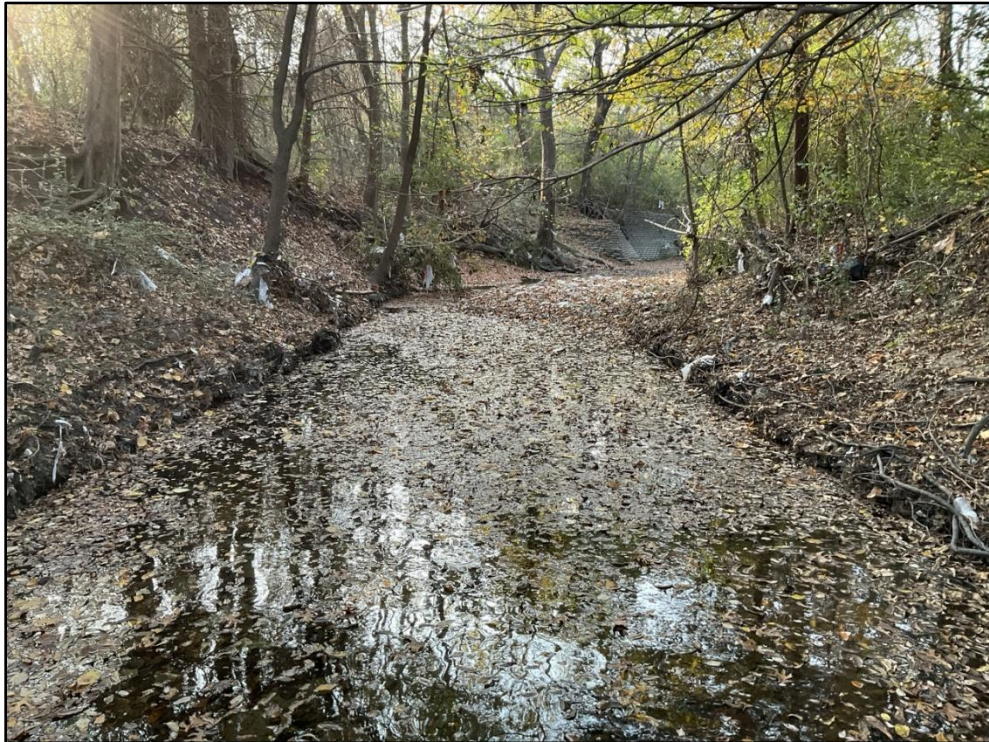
STA 7+50 – Location of Mauk Branch cross section 1, looking downstream.
